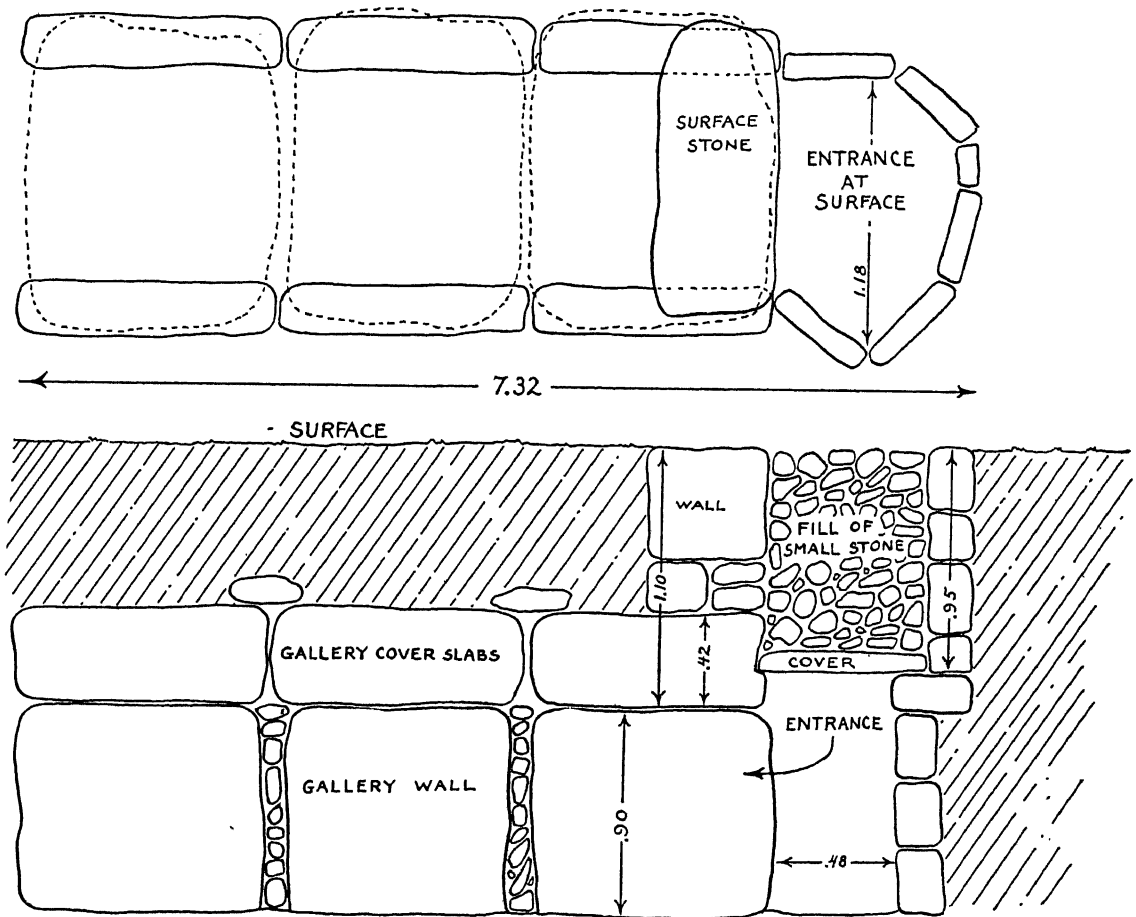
Groundplan and cross-section of Recuay style gallery, Wilkawain.
